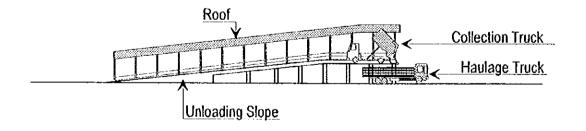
Layout Plan of Transfer Station In Koror
